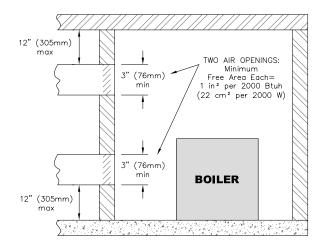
Air Openings – All Air from Outdoors through Horizontal Ducts
